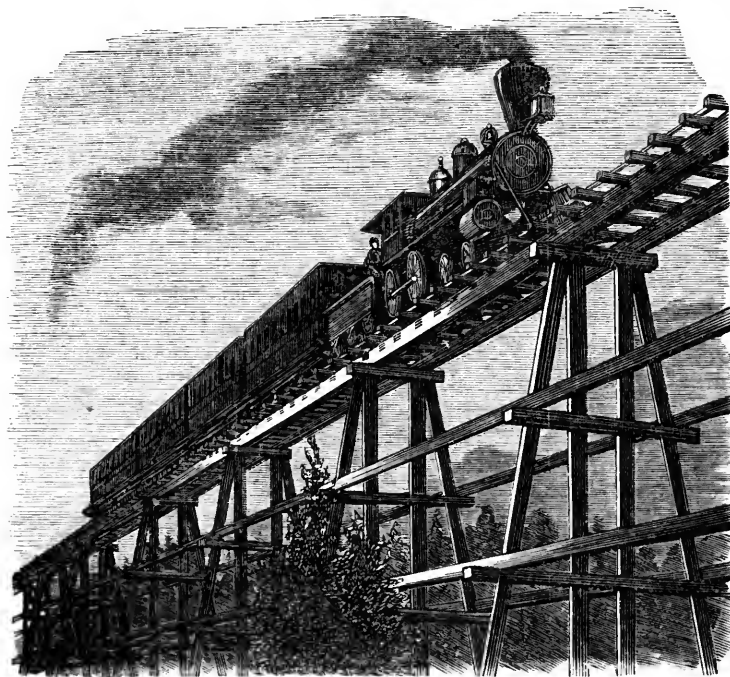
TRESTLE BRIDGE AT SHERMAN, NEAR DALE CREEK (PACIFIC RAILROAD)
